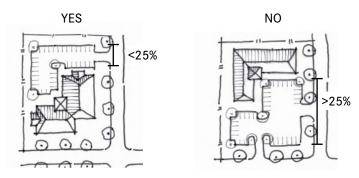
Parking shall be located on the side or behind buildings where possible.
